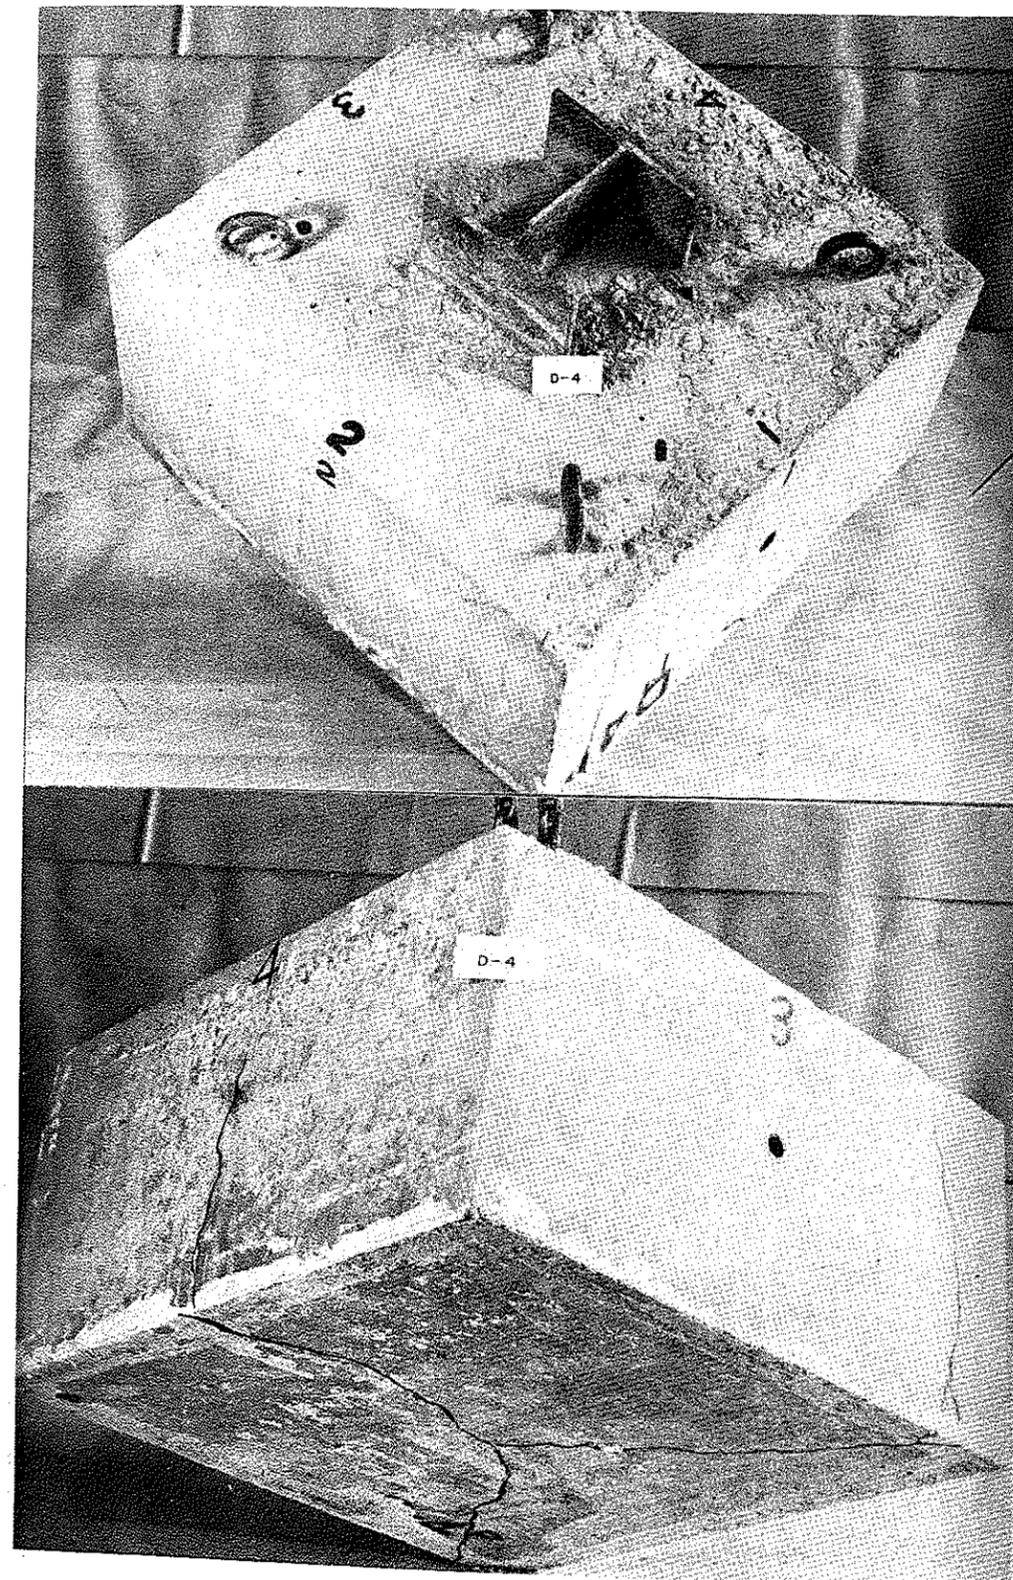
APPEARANCE OF SPECIMEN D-4 AFTER TESTING.
